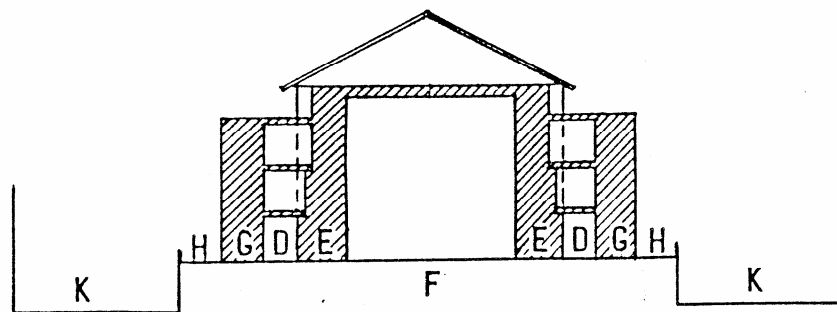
SECTION THROUGH HOUSE SHOWING SIDE CHAMBERS
